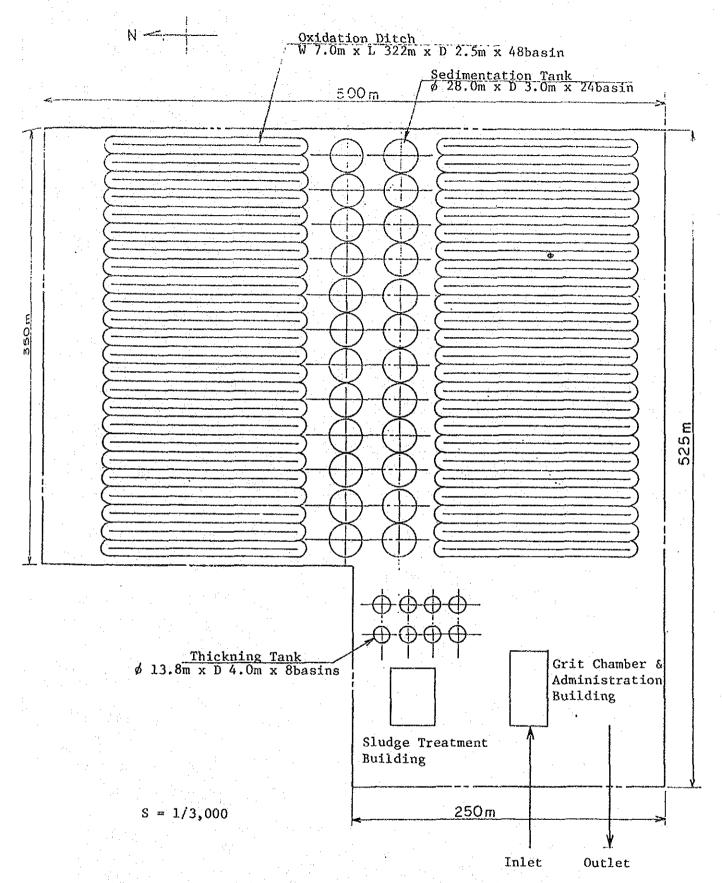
Layout Plan for Oxidation Ditch System in Proposed site "Cerro de la Chira"
